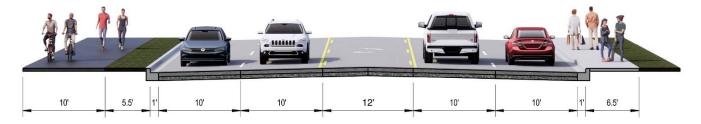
Pavement Replacement as a Narrow 5-Lane Facility with Monolithic Sidewalk and Multi-Use Path on West Side (County A to Bonanza Drive), facing north
